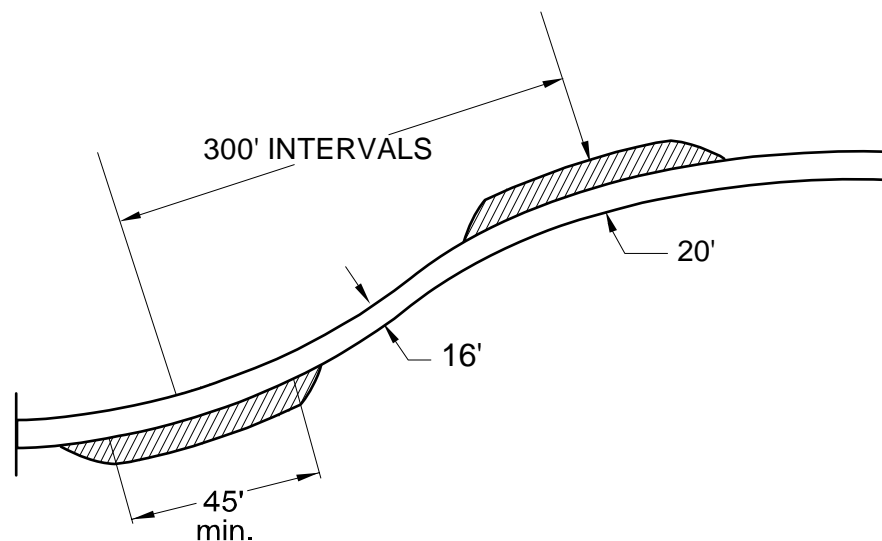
FIRE TURN-OUT FOR EXTENDED DRIVEWAYS
